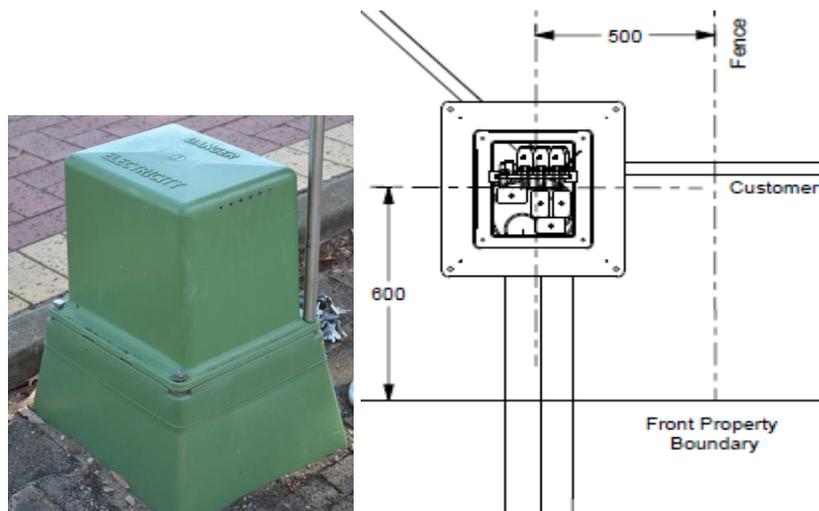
Standard Arrangement - LV Service Pillar (above ground level)
